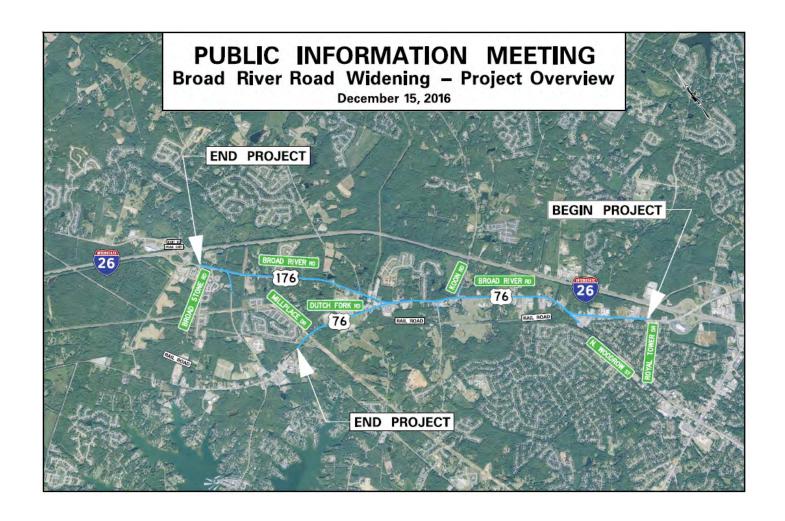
Exhibit A – Broad River Road (US 76) Widening Project Limits (as presented at Public Meeting dated Dec 15, 2016)
